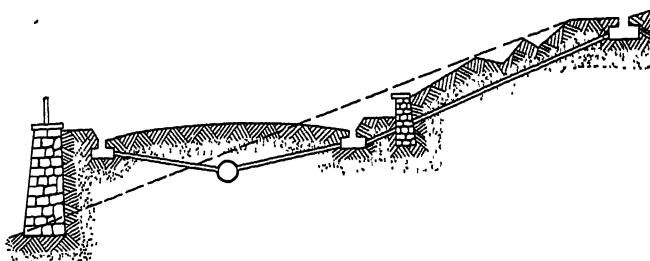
Reinforcing Roadway by Parapet Wall or Fence
